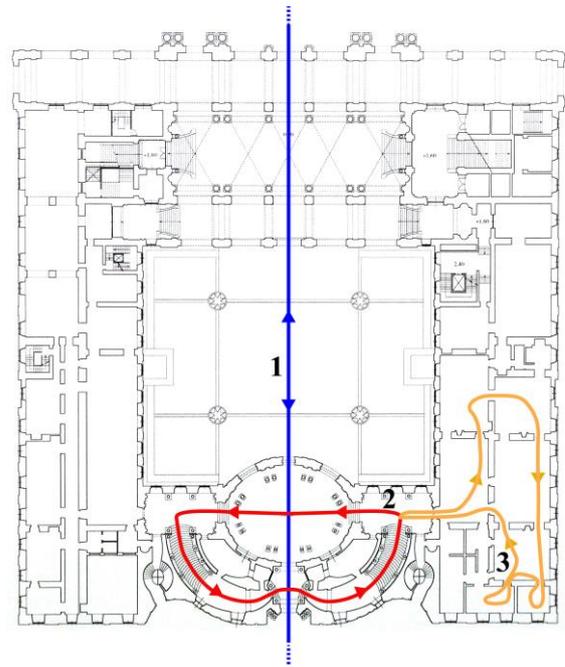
Floor plan of the building with layout of some VT routes (Editing by M. Russo)
